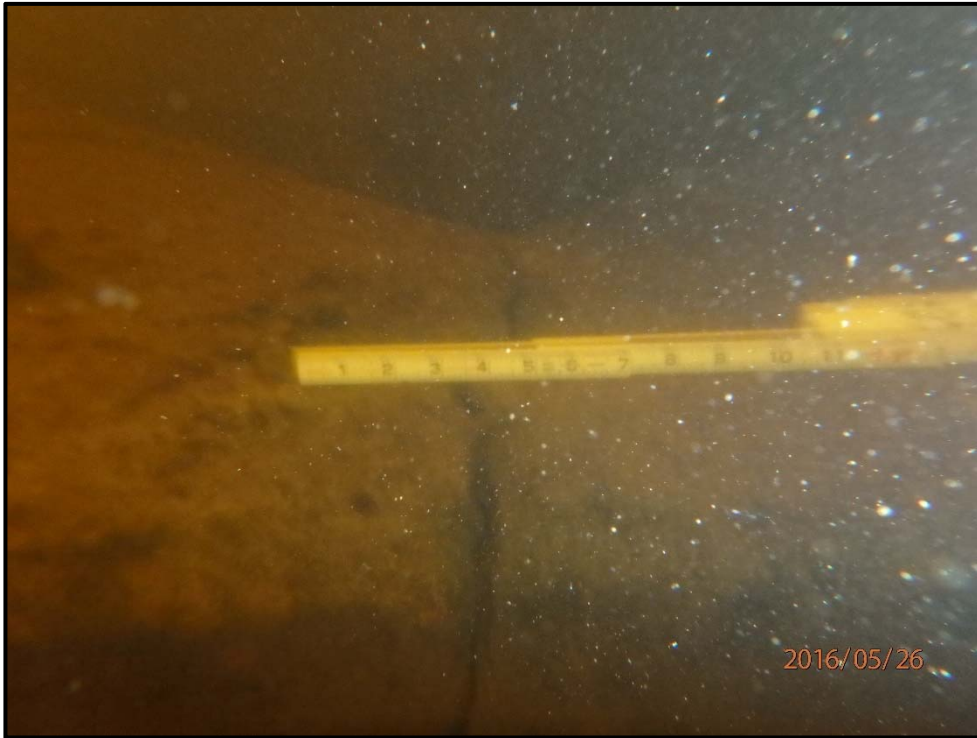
Typical Vertical Crack in Exposed Footing (Pier 2 Shown, North Nose)
